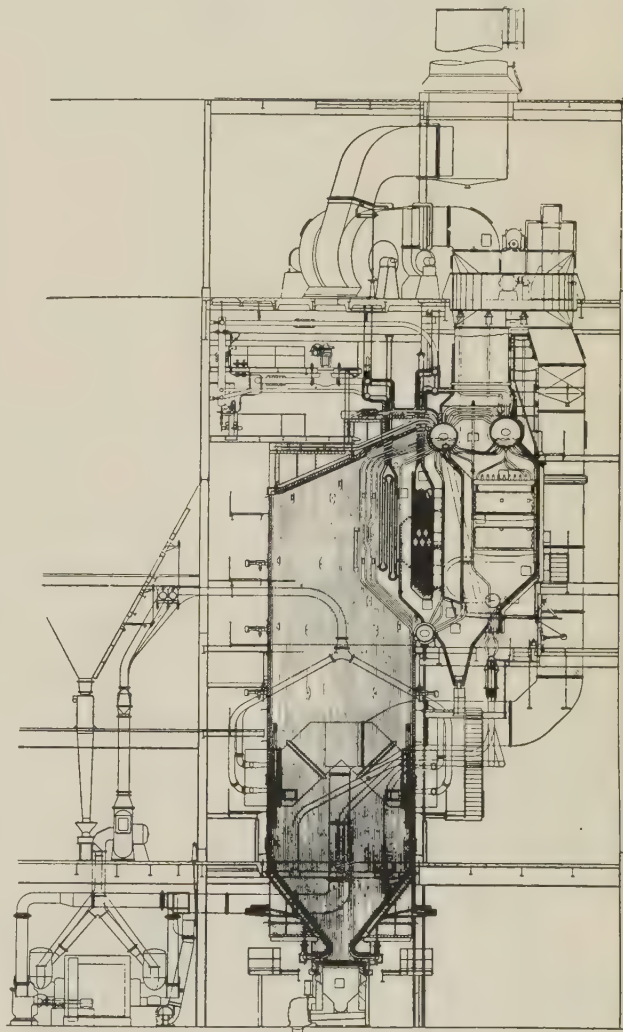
SECTIONAL ELEVATION OF STEAM-GENERATING UNIT
